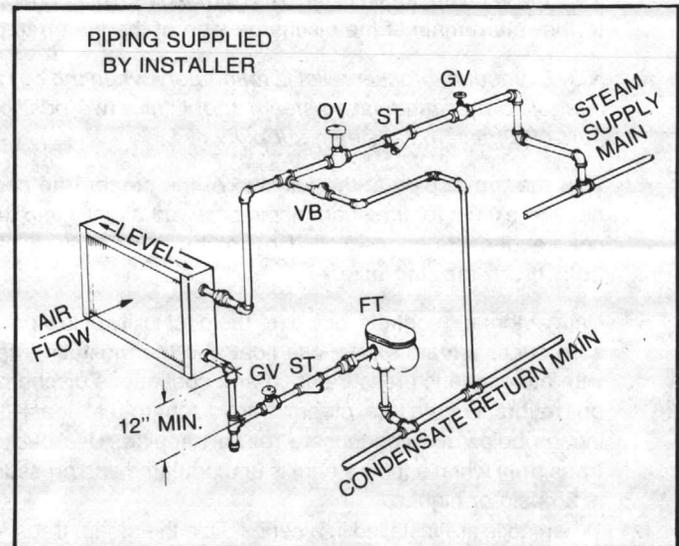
Type T Steam Coils, Horizontal Tubes for Horizontal Airflow
